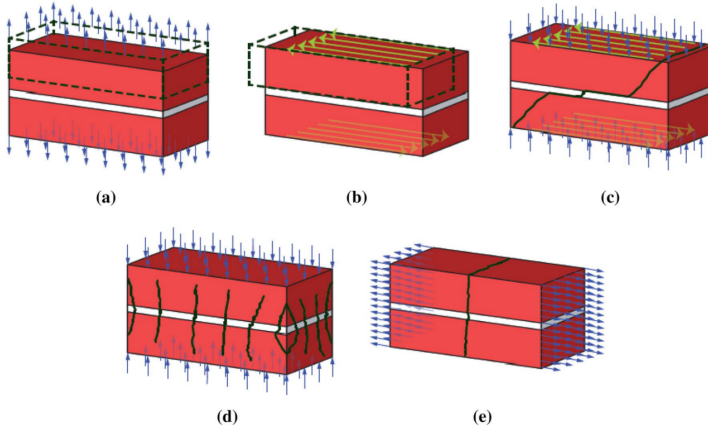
Local failure mechanisms of brick masonry: (a) tensile failure of brick-mortar bond, (b) shear sliding, (c) diagonal cracking, (d) crushing and (e) tensile cracking through the bricks and mortar. Image taken from [1].
